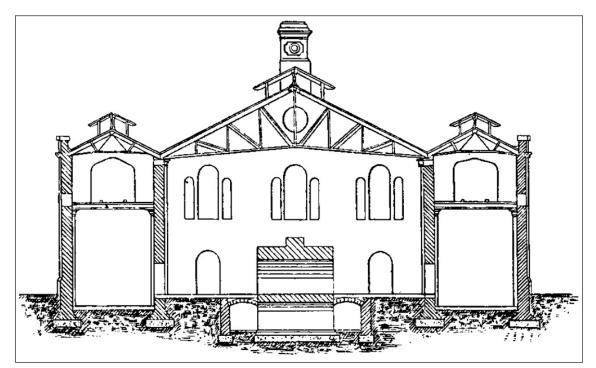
A ground-floor horizontal retort house. Source Newbiggin 1889.
